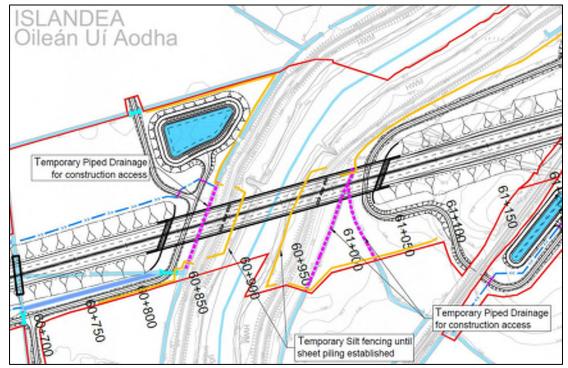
shows the proposed silt protection measures at the River Maigue Crossing.
